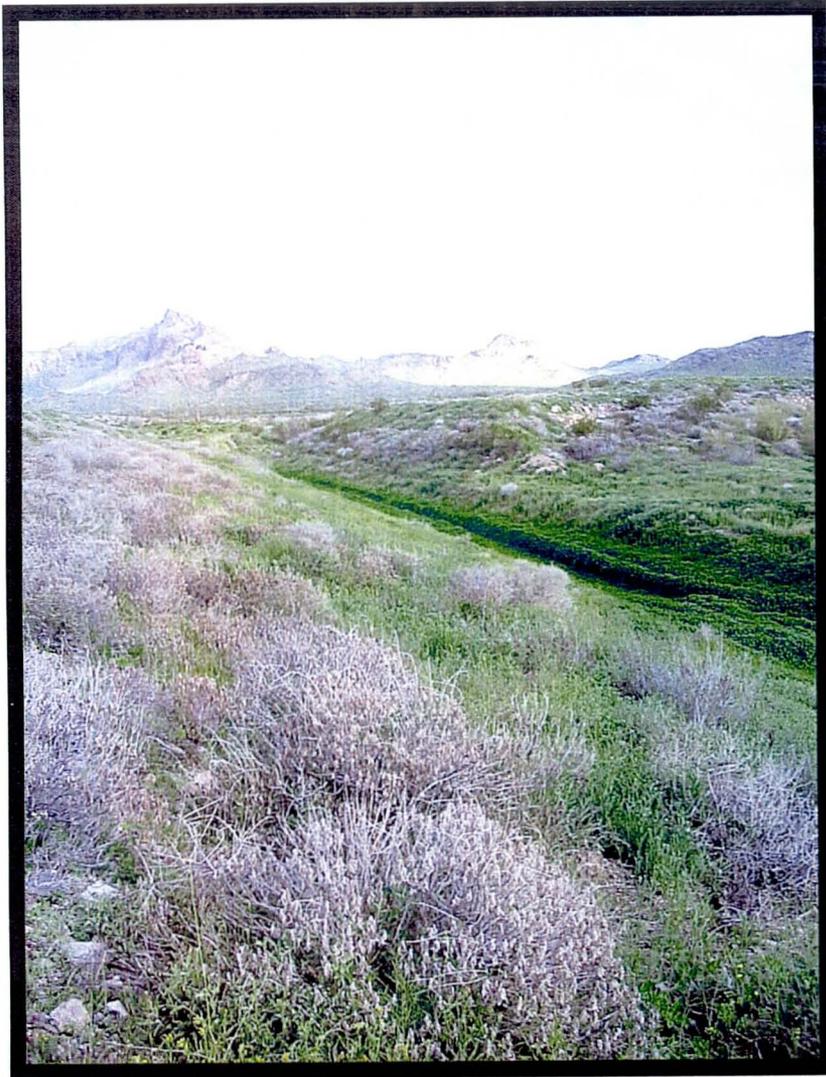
East Abutment, Upstream Slope, Reach 1: Generally wet/damp conditions, dense low growing vegetation. The upstream slope appeared to be in good condition with no signs of cracking.
